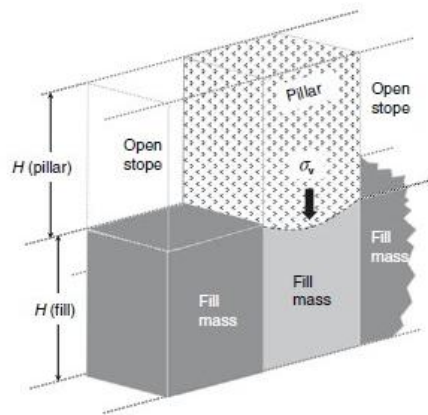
Schematic view of vertical loading on the backfill block next to a pillar
